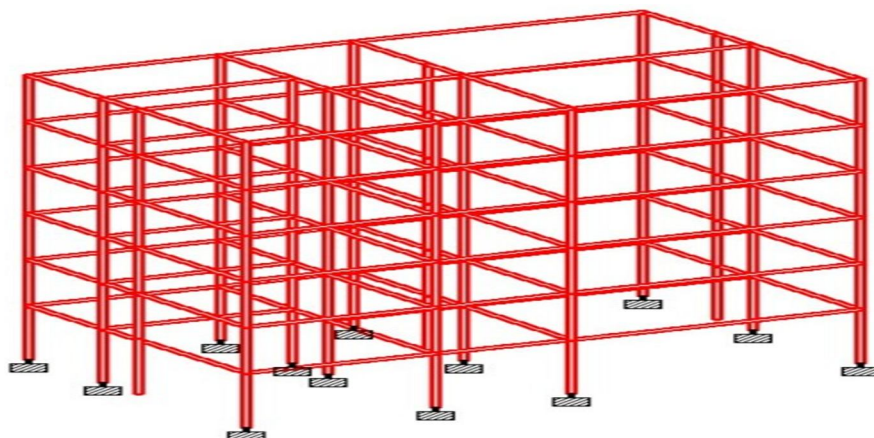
Three dimensional rendered view of the building from STAAD Pro
